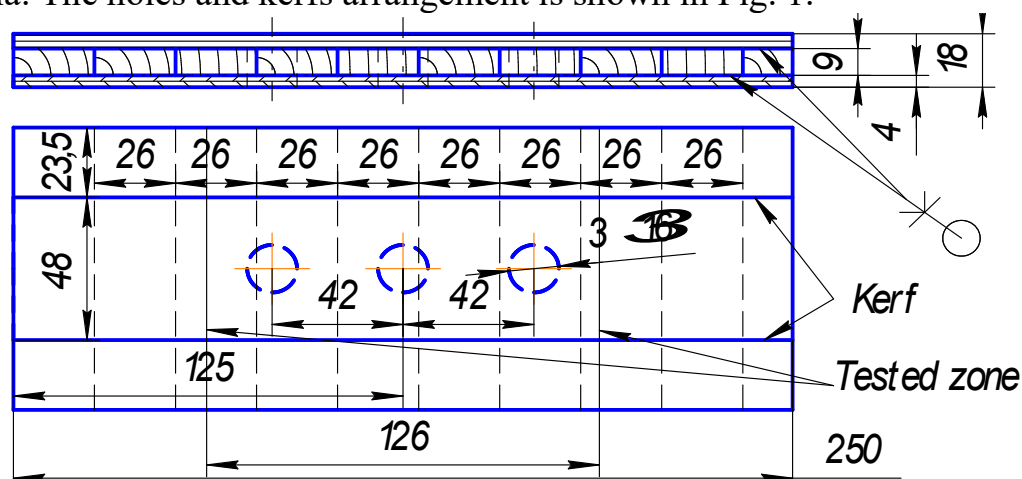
Specimen for testing the parquet board strength: 1 – kerf; 2 – tested zone
